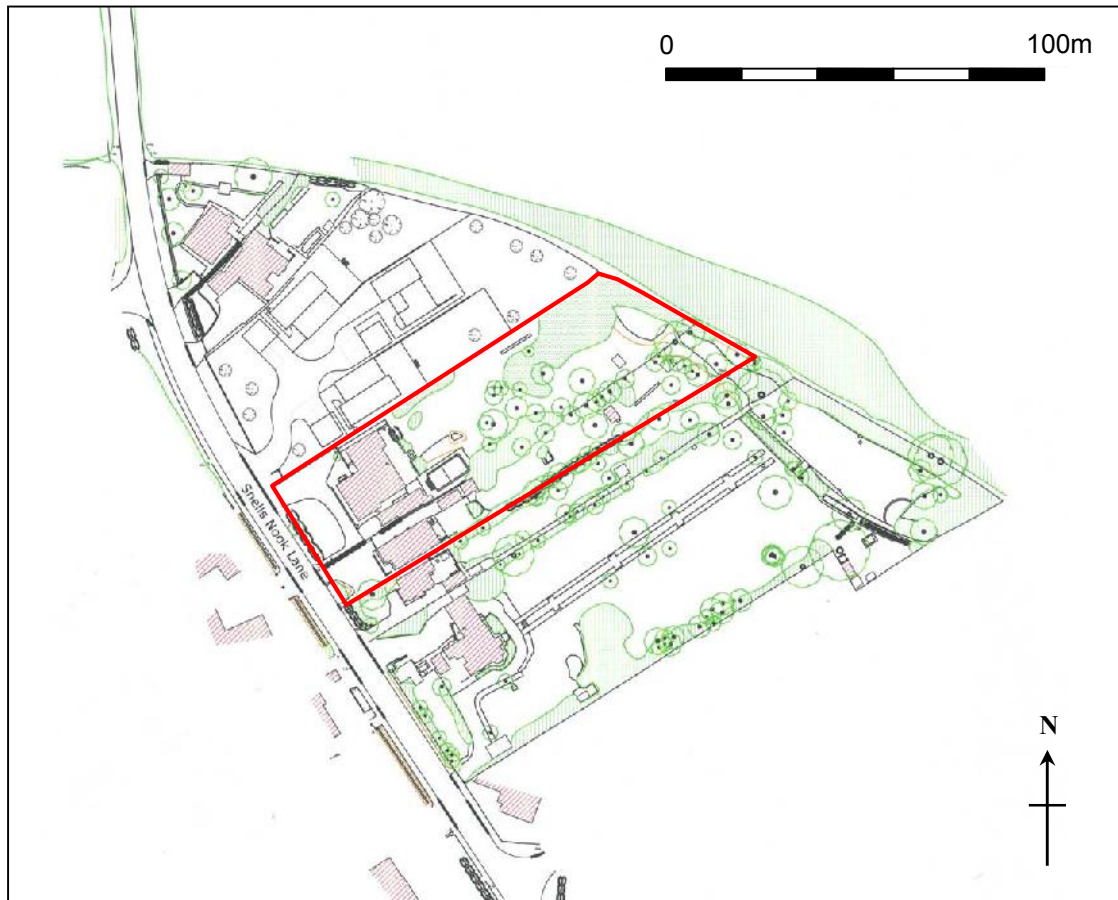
Location plan of the site at scale 1:2000. The application area is outlined in red. Plan supplied by developer.
